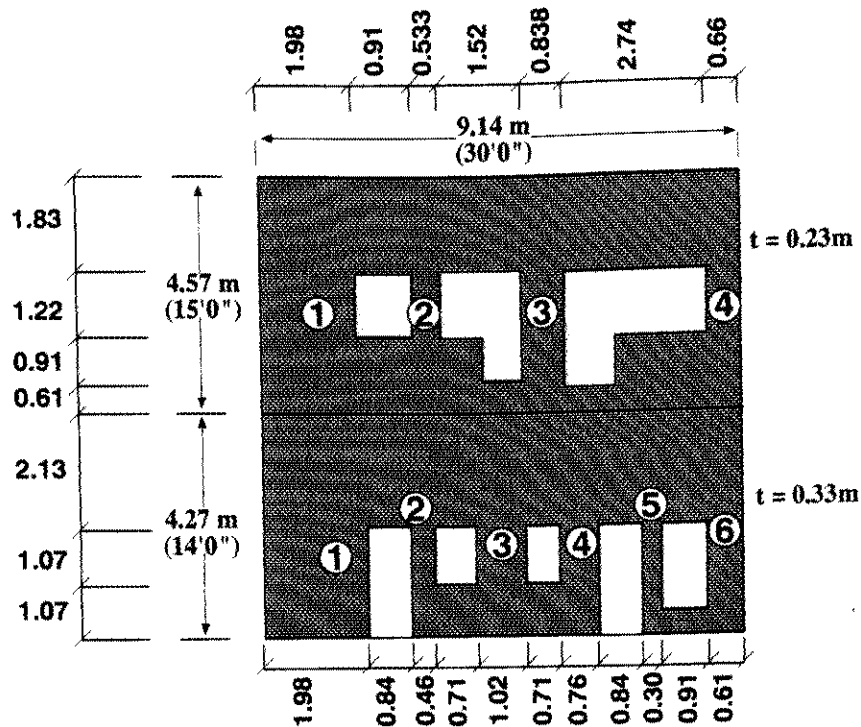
Dimensions and piers considered for north wall in-plane strength evaluation.
